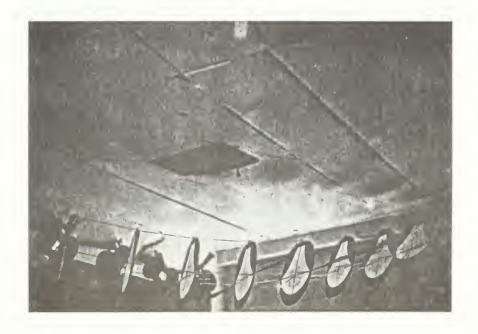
West India Goods Store, interior of first story, bay C, showing hole 12 by 9-1/2 inches cut in wood ceiling.
